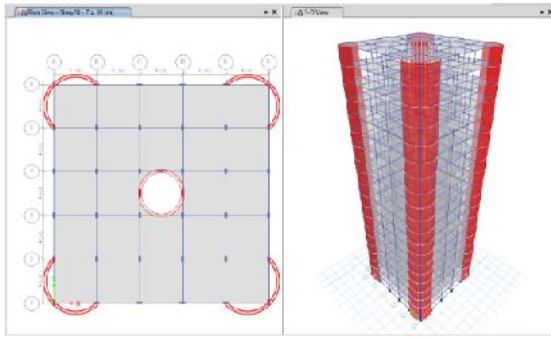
Model 5 (building with circular Core wall and curved shear wall at each Corner of the building)
